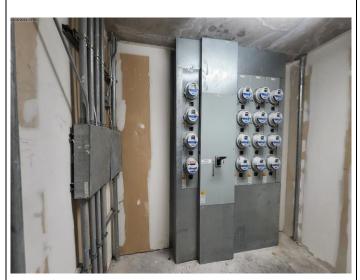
Item 5.9. Level 5. Meter Electrical Room.
